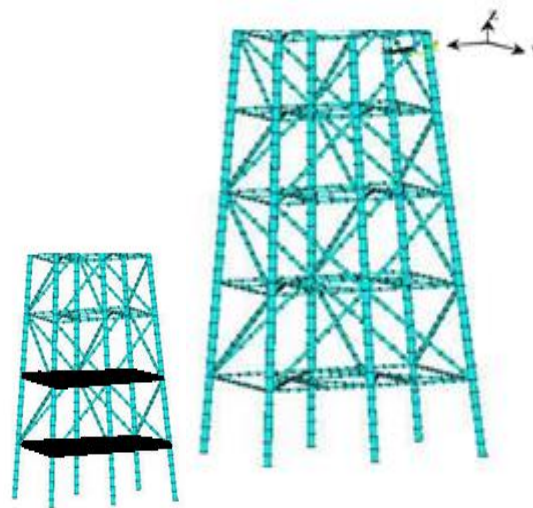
A view of the produced geometrical model and the lower deck for the SPD21 platform
